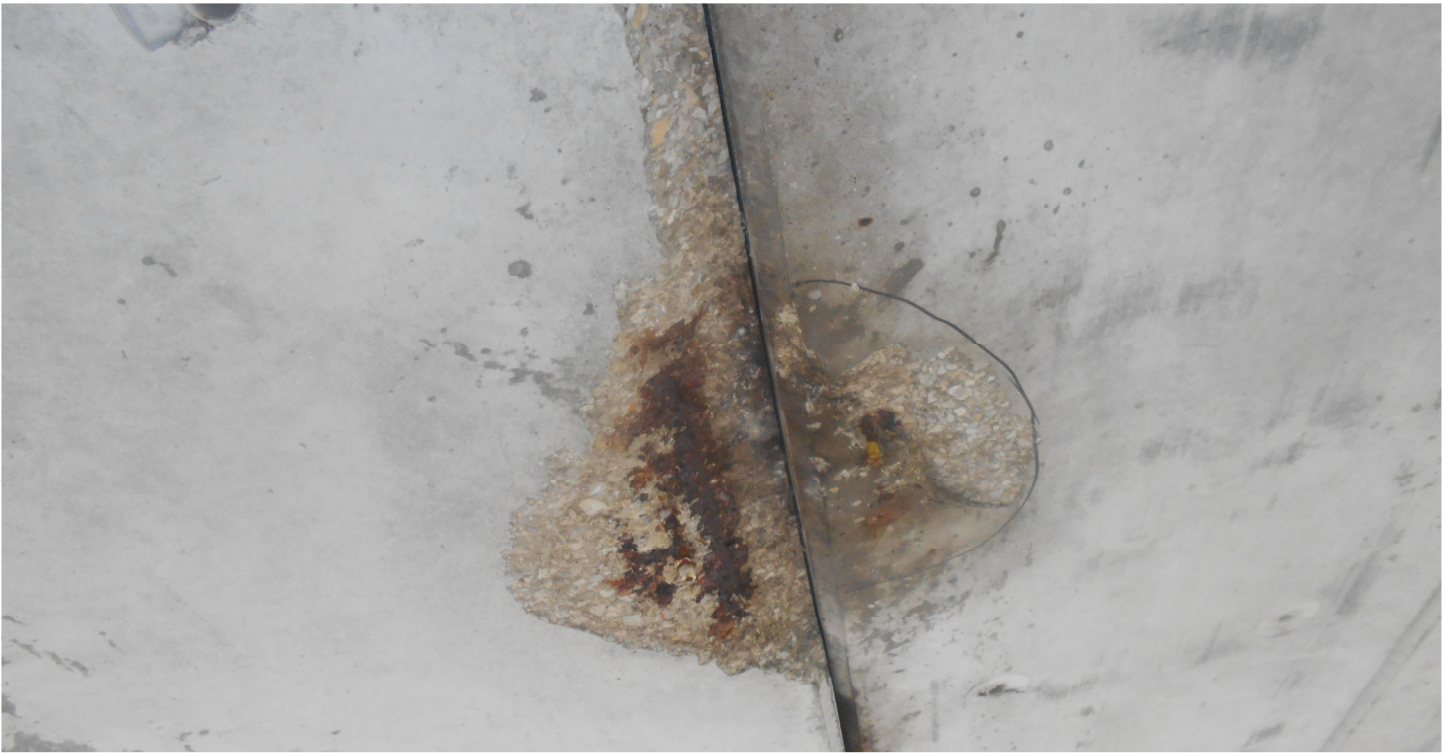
2' x 1' x 2.5" Deep Spall with an Exposed Prestressed Strand near Midspan - Beam 7, Span 3
